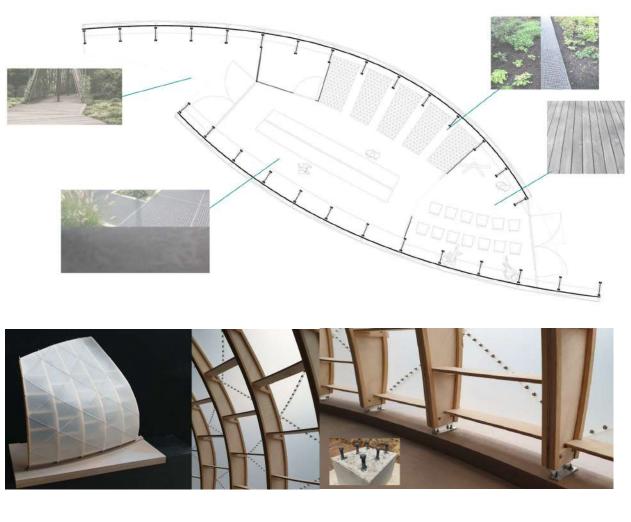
Greenhouse pavilion - plan, detail - preliminary design.
